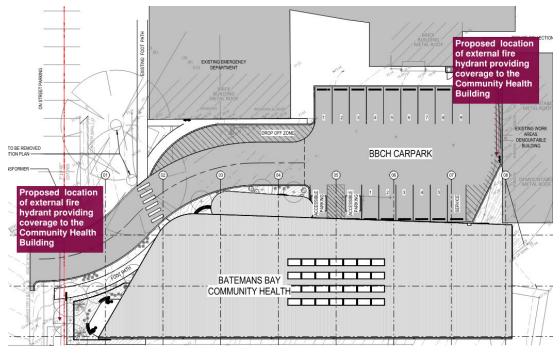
Location of proposed external fire hydrants serving the Community Health Building
